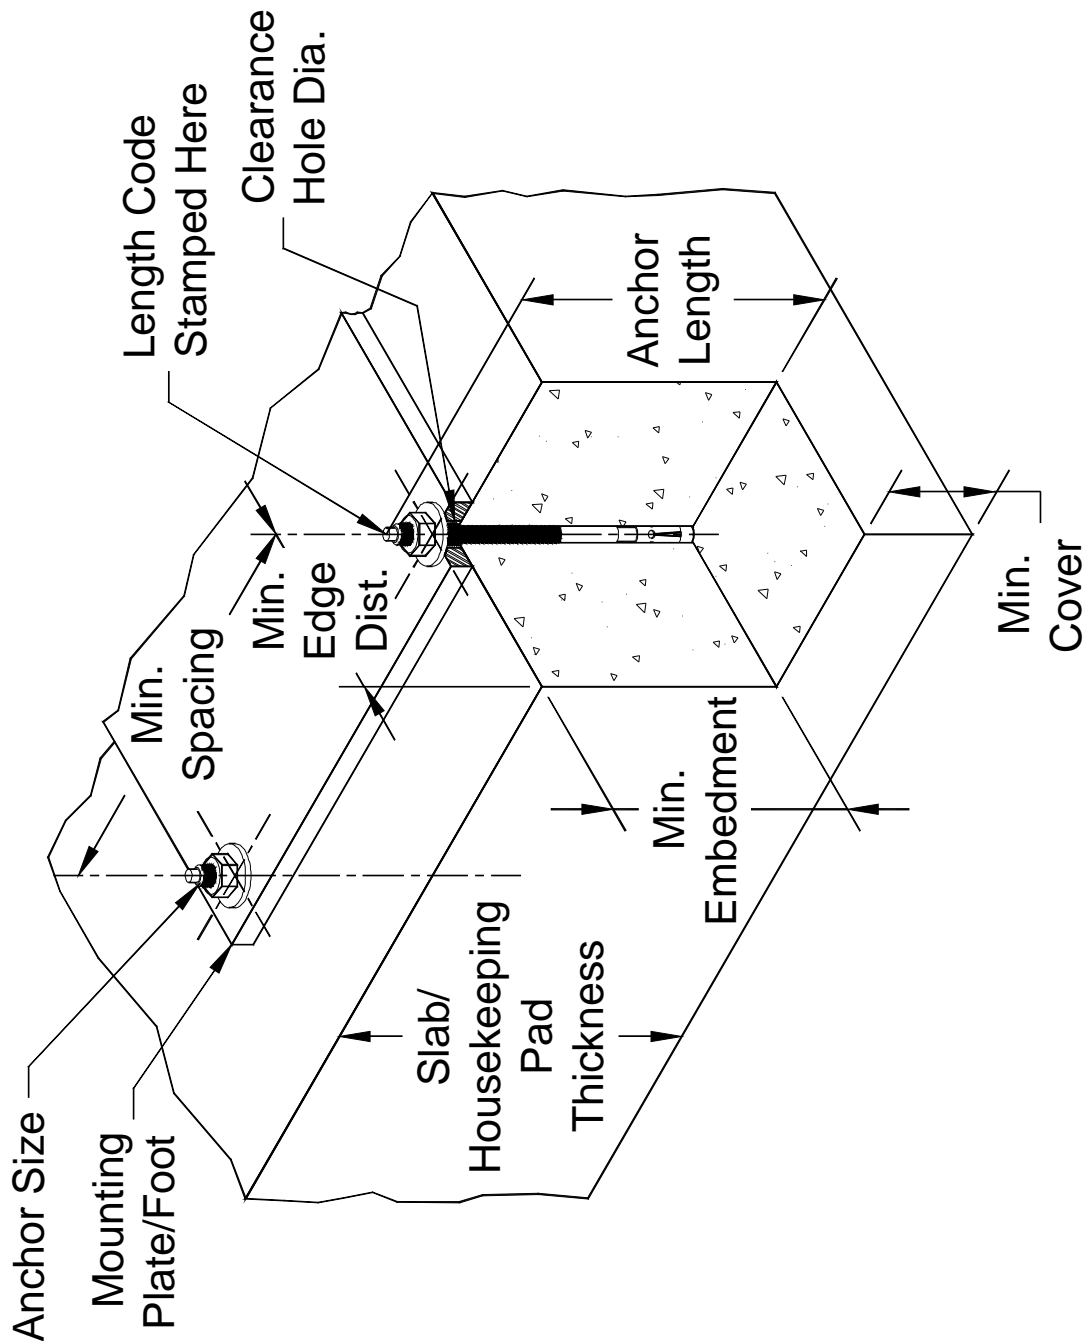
; KCCAB Cracked Concrete Seismic Anchor Installation Guide
